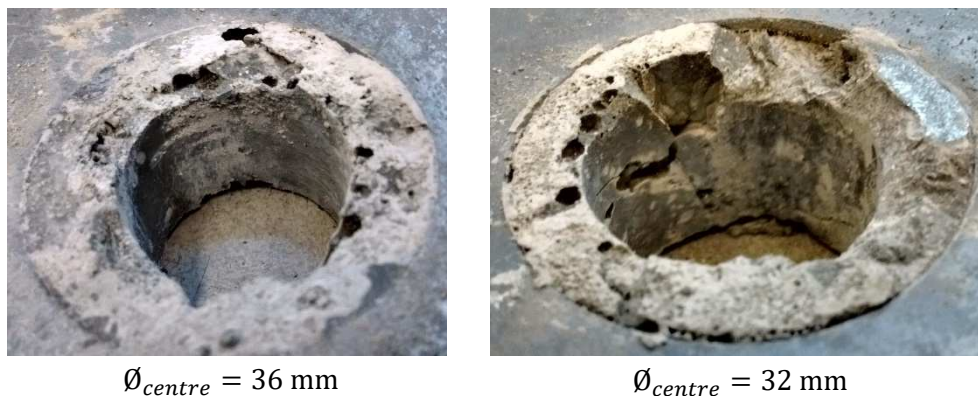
Centre plate bolt holes of grout-injected specimen after loading
